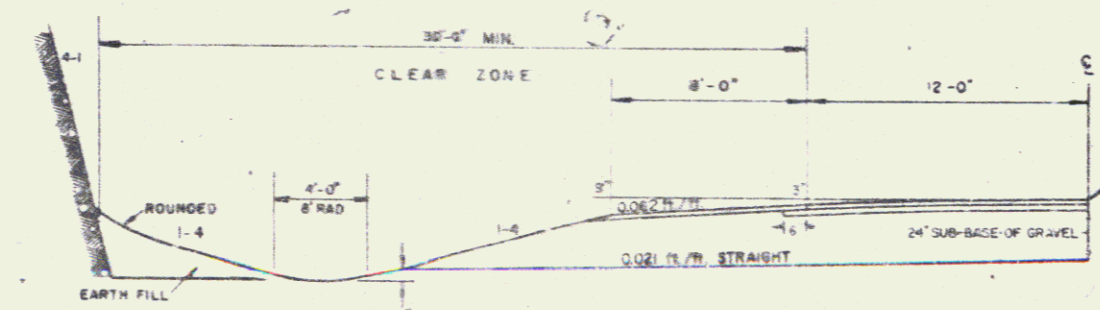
DETAILS OF DITCH AND BACKSLOPE FOR LOW SIDE OF 0.42 BANK OR MORE
